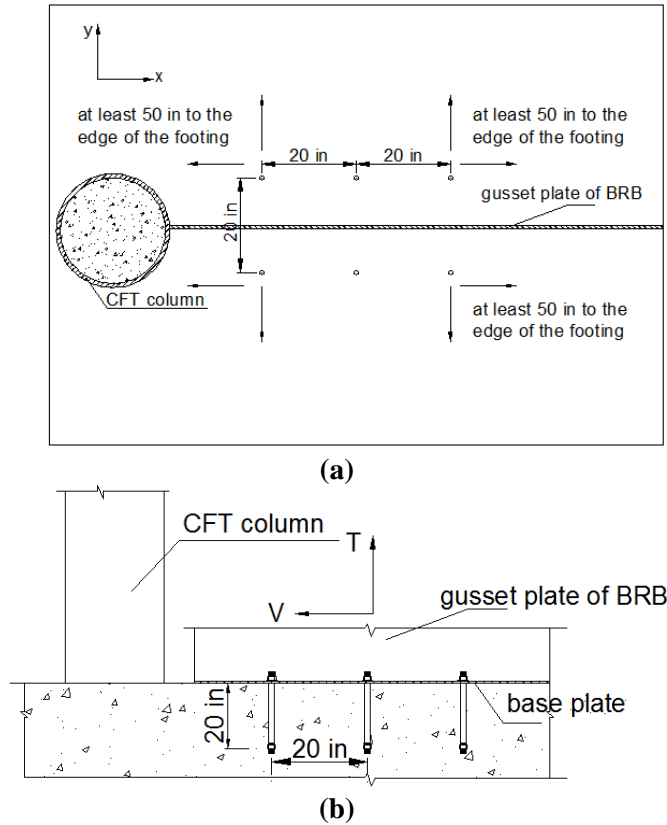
(a) Top view of BRB gusset plate connected with foundation (b) Side view
